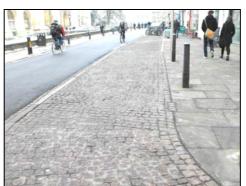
King's Parade kerb build-out at junction with Bene't Street
